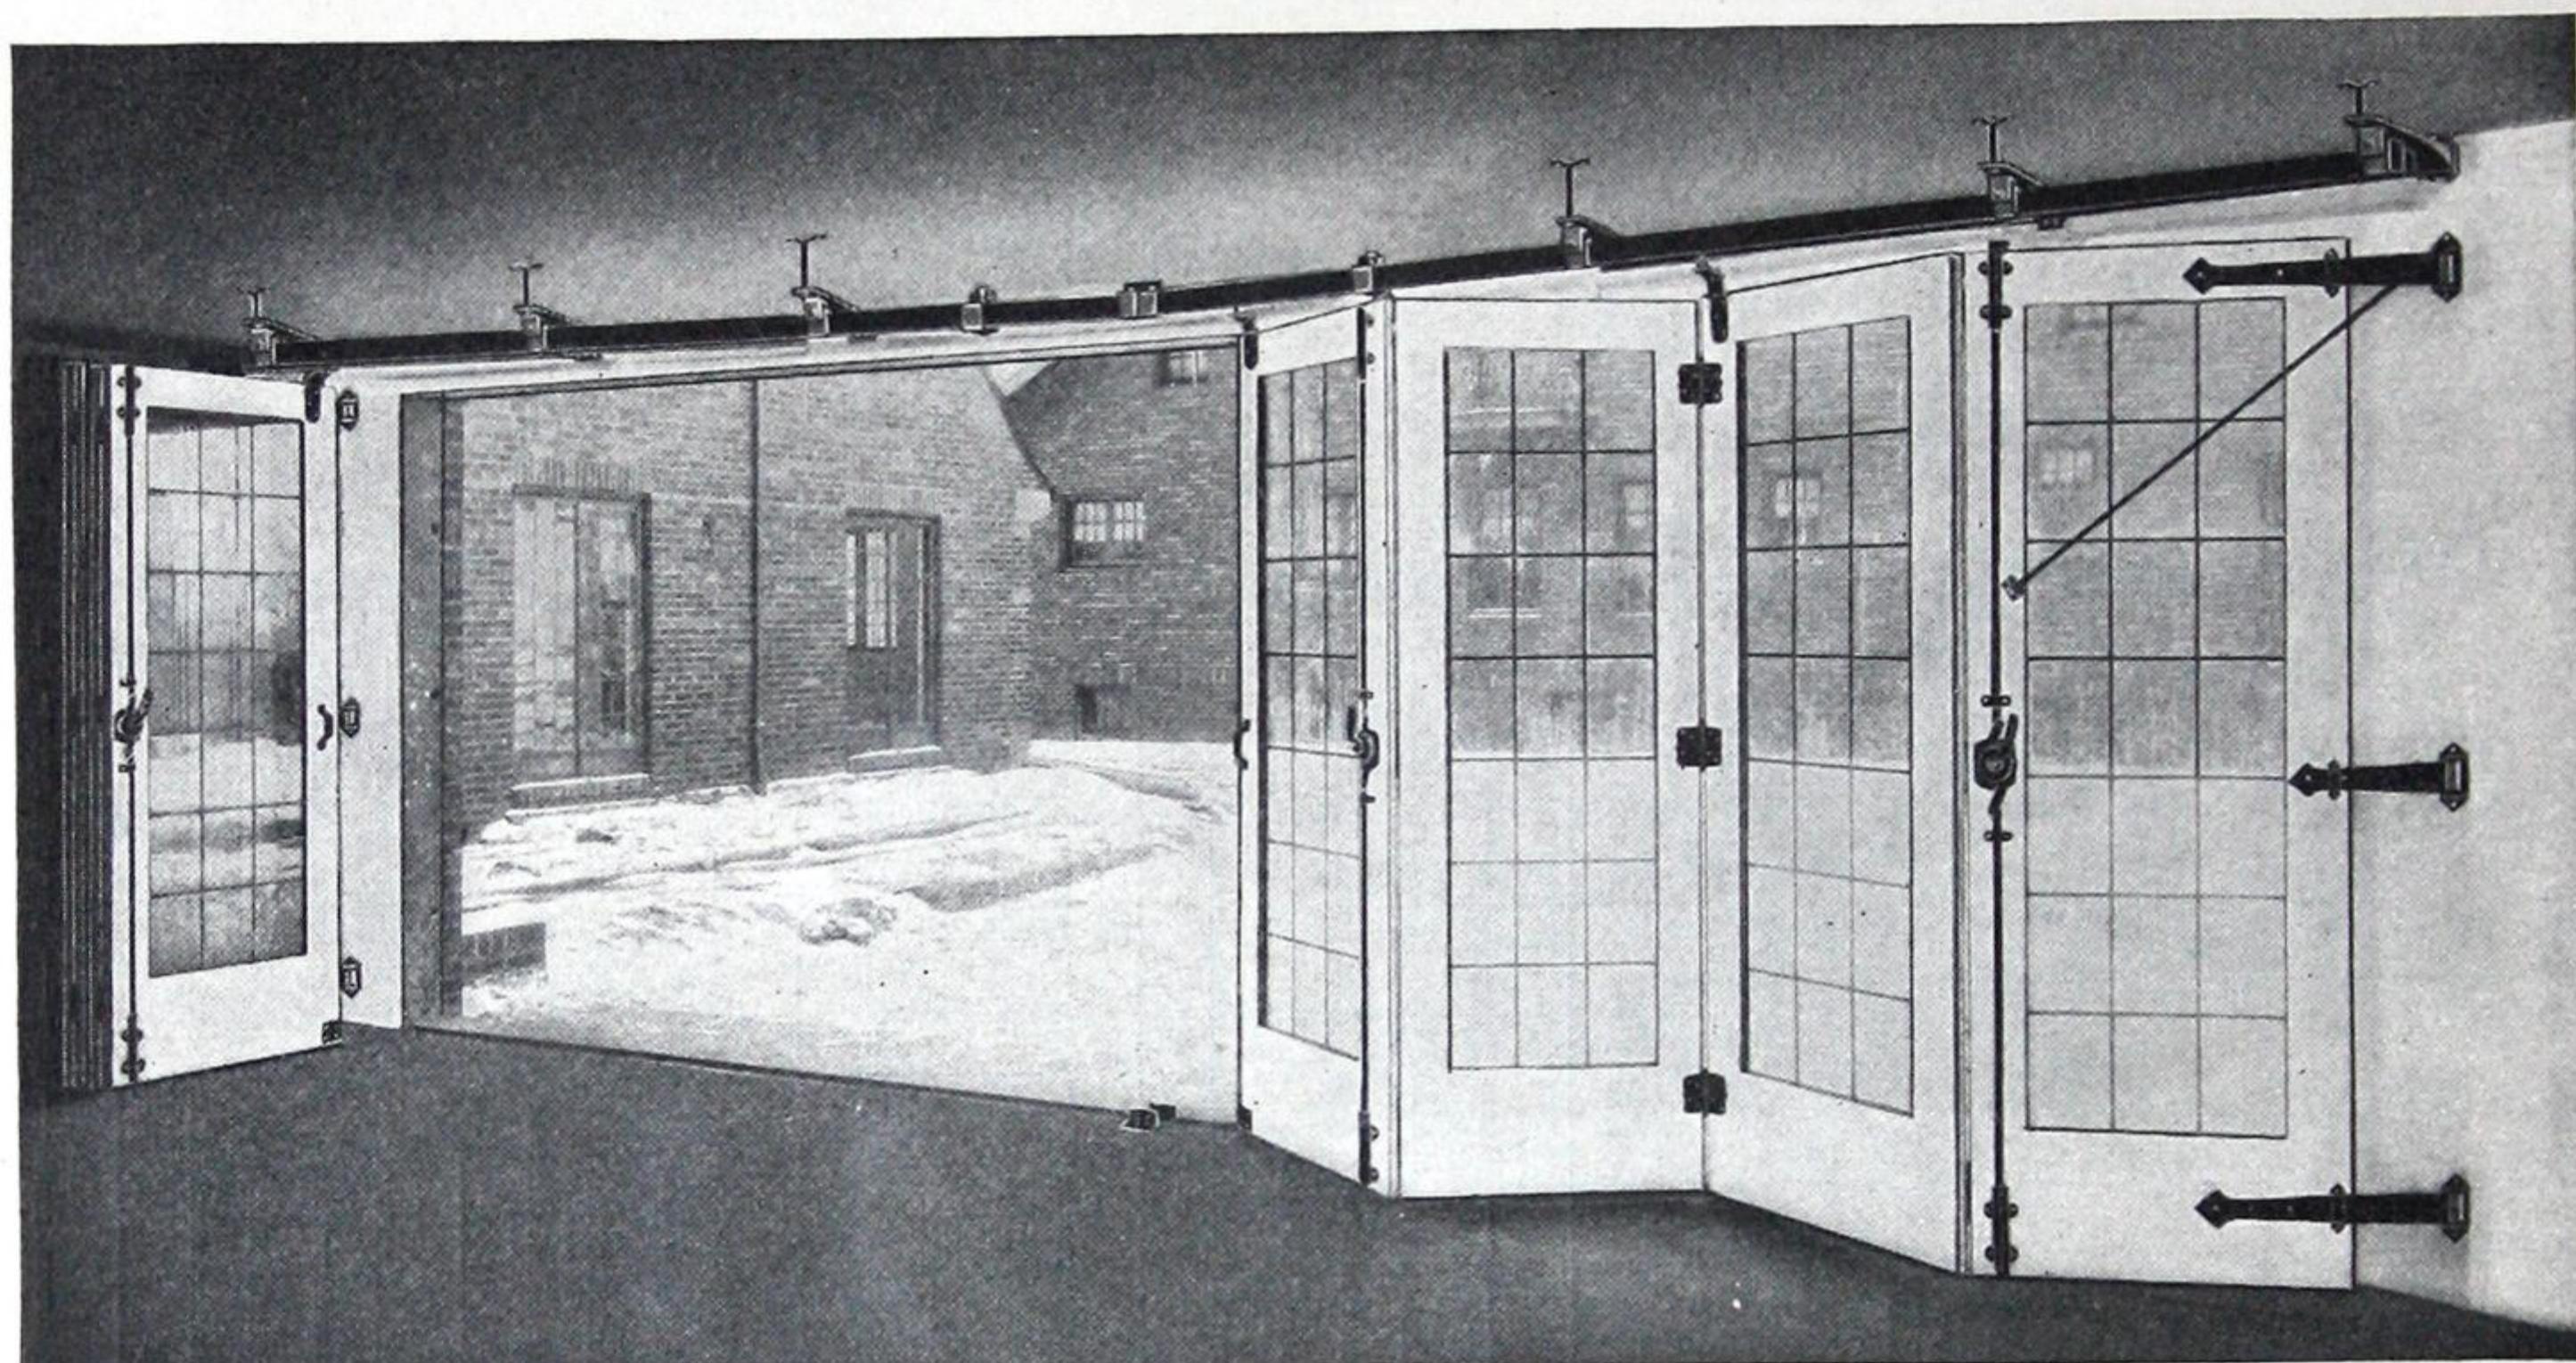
Interior View. Doors Opening In. This Illustration shows a Four Track 8-Door 1035 Heavy Hardware Set.
